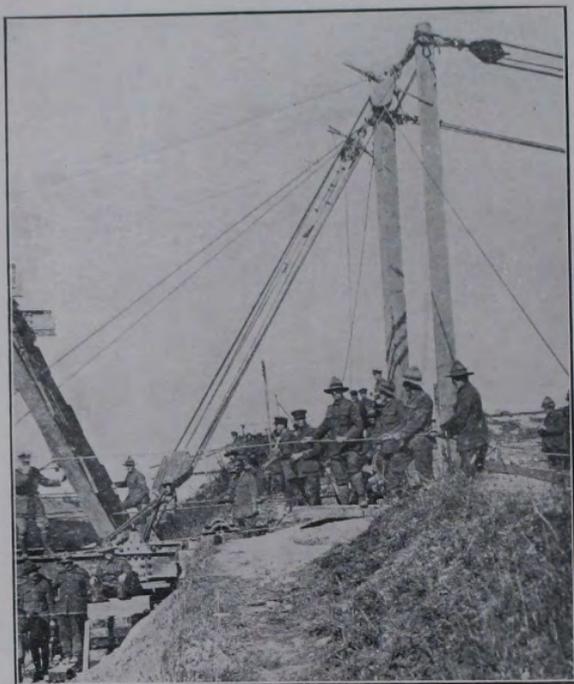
Photograph XXII.—Timber Approach to Bridge at Tronville Chateau, April 1918. 4th Army.
